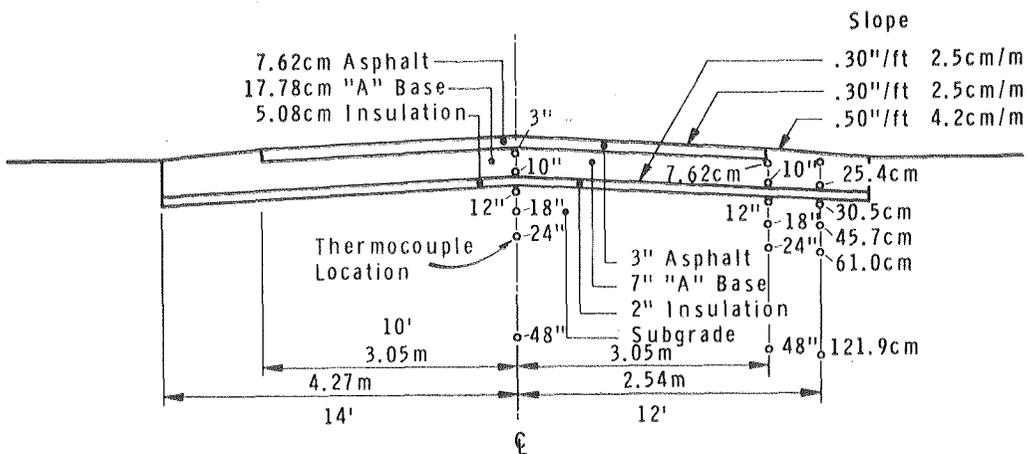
Pavement design and thermocouple locations for insulated sections at the Ottawa site
